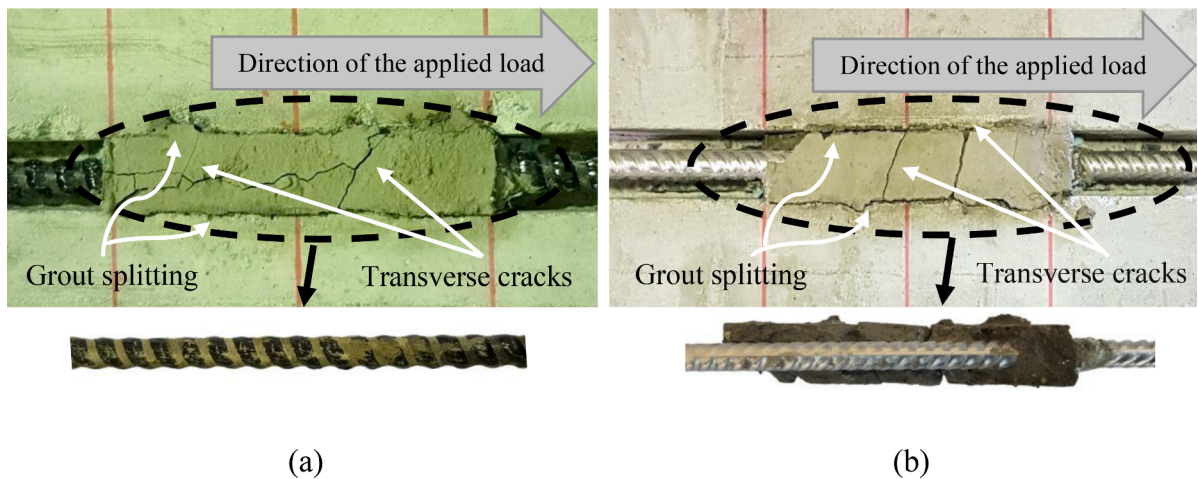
Failure at the bar-grout interface in specimens: (a) B-D-12-SG and (b) SS-D-12-SG.
